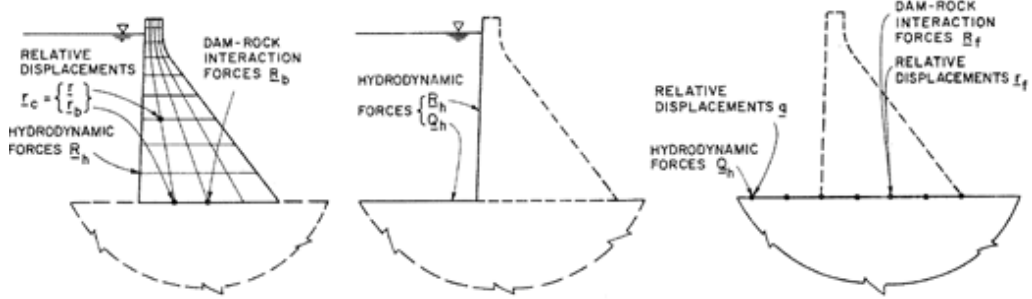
Substructures of the dam-reservoir-foundation rock system
